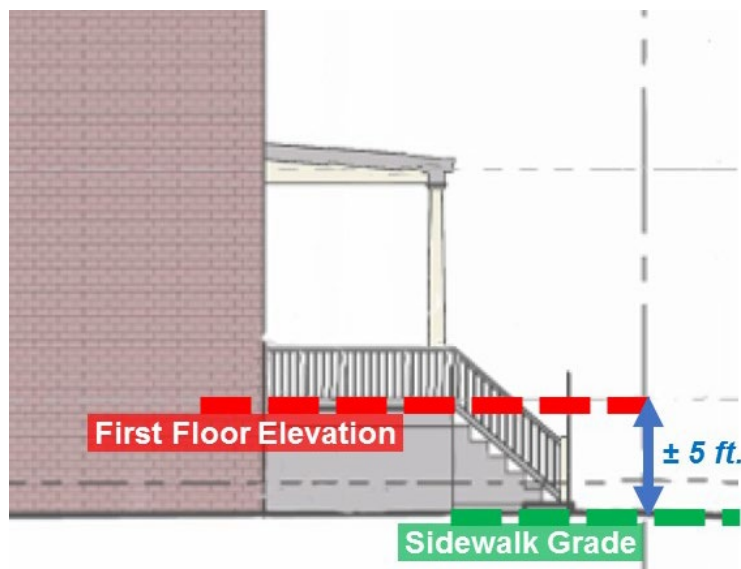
The distance between the first floor elevation and sidewalk grade for the townhouse entrances on King Street
